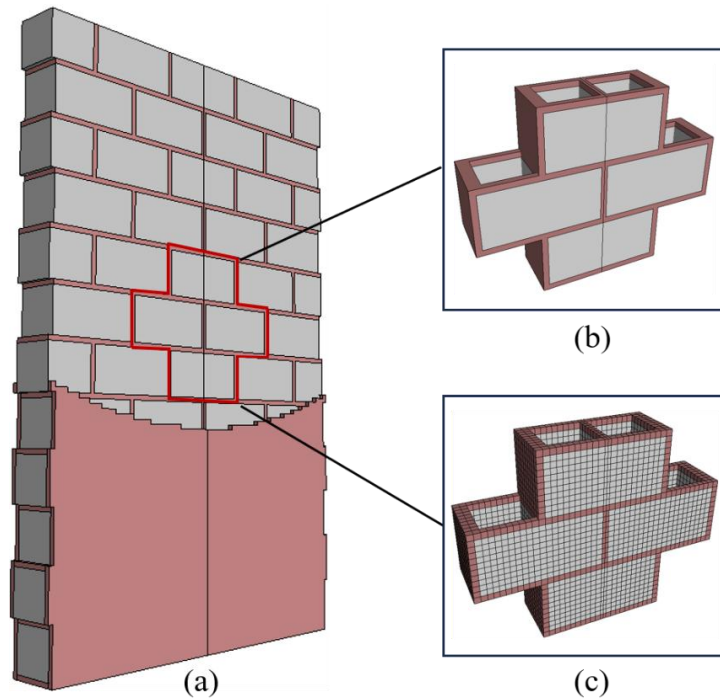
Discrete model: (a) hollow masonry wall model, (b) masonry assembly model, (c) discretized model of the masonry assembly
